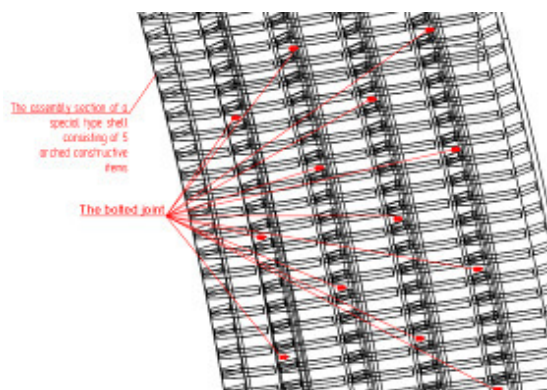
The proposed constructive implementation of the arrangement of the bolted connection
